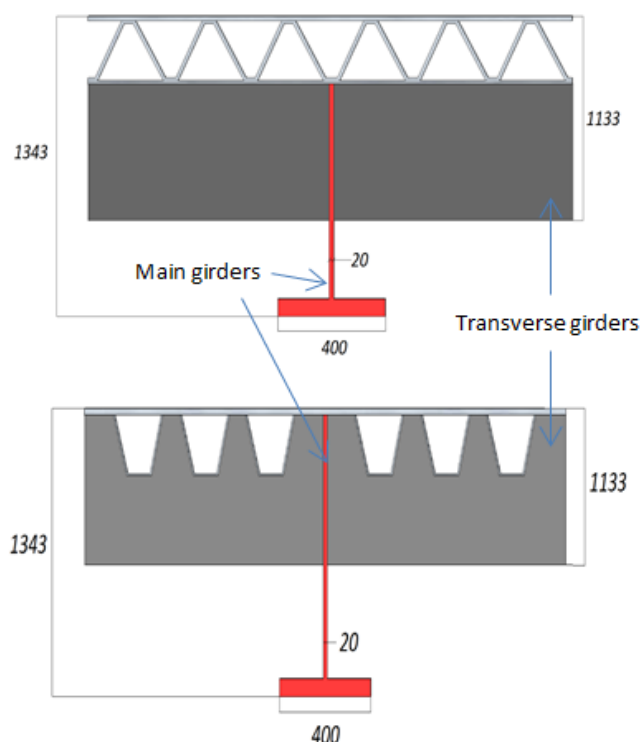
Illustration of the cross section of the bridge with the SSP deck (above) and the bridge with the orthotropic deck (below).
